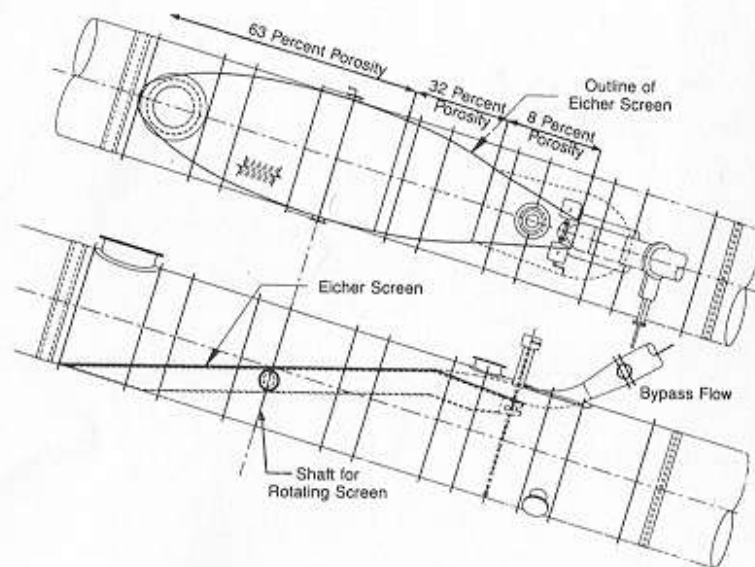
Plan and Section Views of the Elwha Eicher Screen (courtesy Harza Northwest and Hydro Review).
